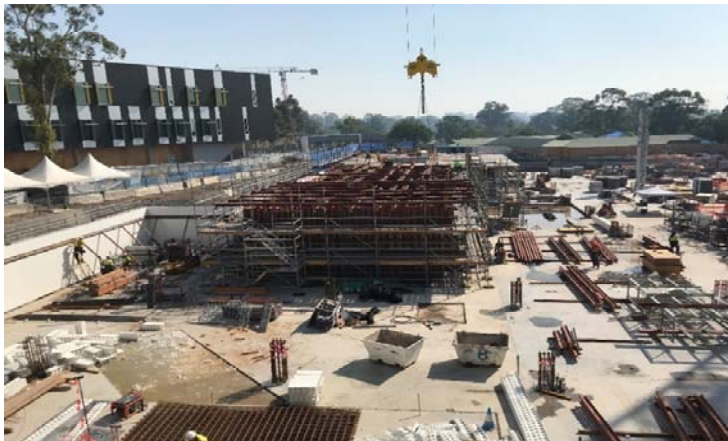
Looking at the site from the top view, ground level has been concreted.
